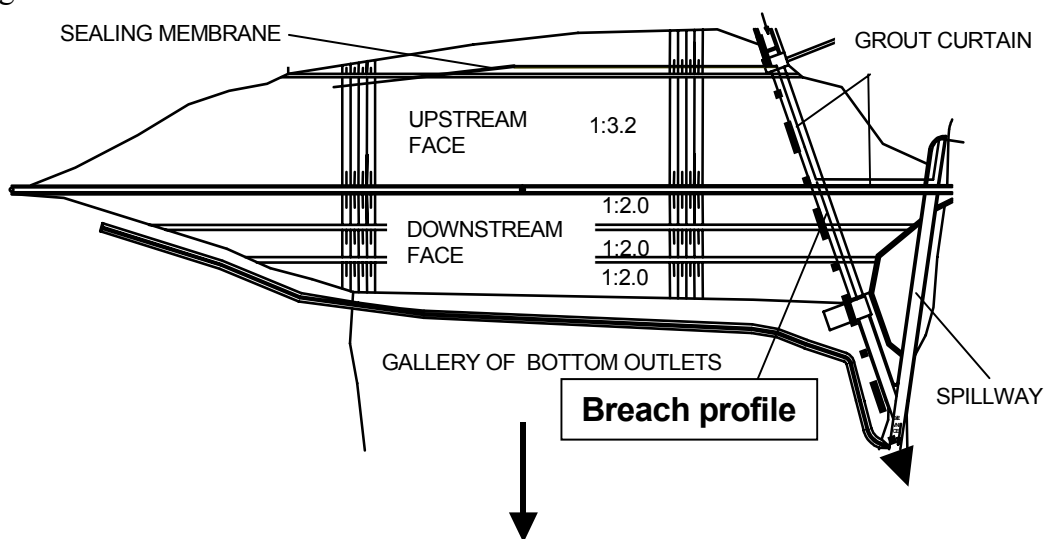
Ground plan of the dam with anticipated piping channel (breach profile)
